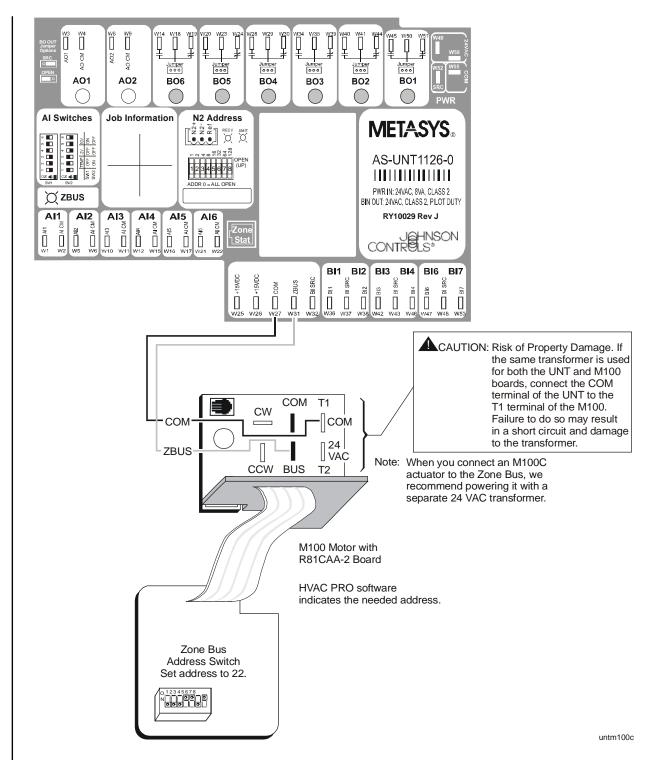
M100C Motor Zone Bus Connection Using an R81CAA-2 Board
